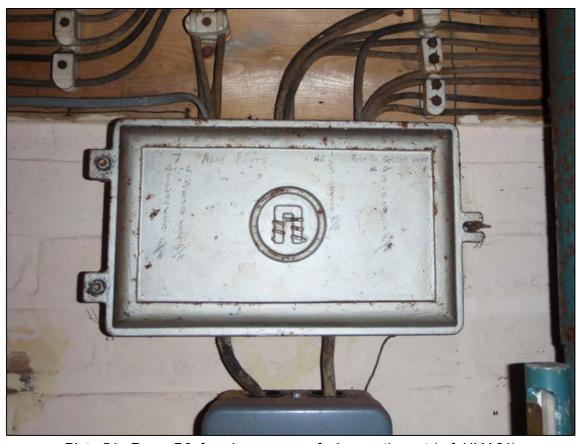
Room B6, fuse box, camera facing south-east (ref. HLY 21)
